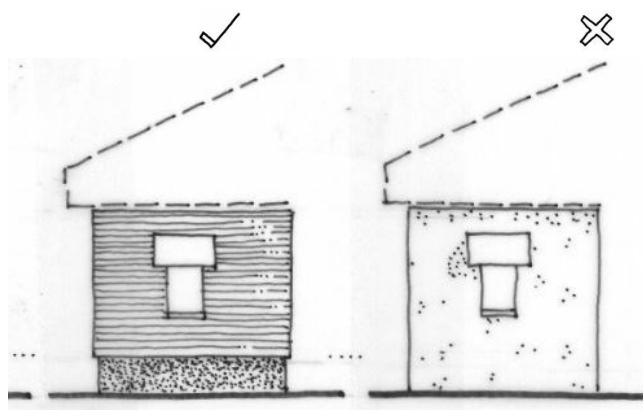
An example of an acceptable construction (left), and an unacceptable construction (right)
